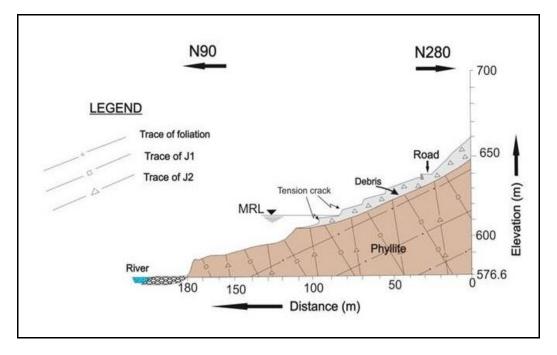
Geological Section of Slope RBS7 Located 3.2 km d/s of Zero Bridge (near Kyari Village)
